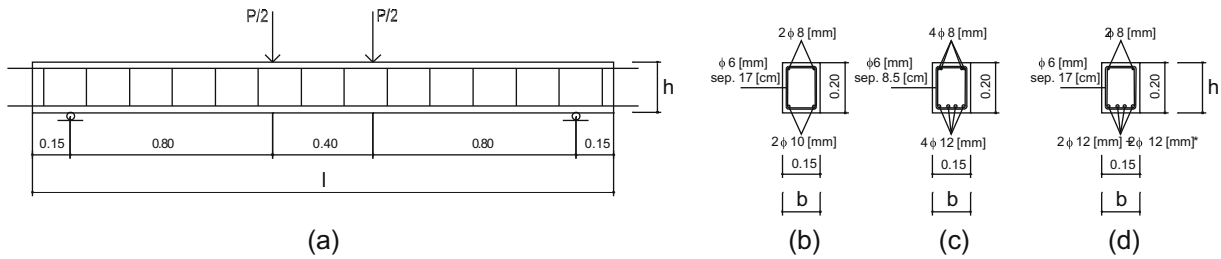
RC beams: (a) Dimensions and boundary conditions (length in [m], except the specified ones). (b) Cross section diagram for beam type 11, $\approx 0.5\%$ steel–concrete ratio. (c) Cross section diagram for beam type 31, $\approx 1.5\%$ steel–concrete ratio. (d) Cross section diagram for beam type 13, $\approx 1.5\%$ steel–concrete ratio ($2 \phi 12$ [mm]* cut-off bars outside of the support zone).
